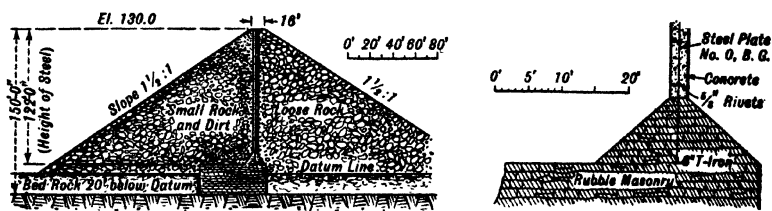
Cross-section of Lower Otay Dam and Enlarged Section of Steel Core Wall at Base.
